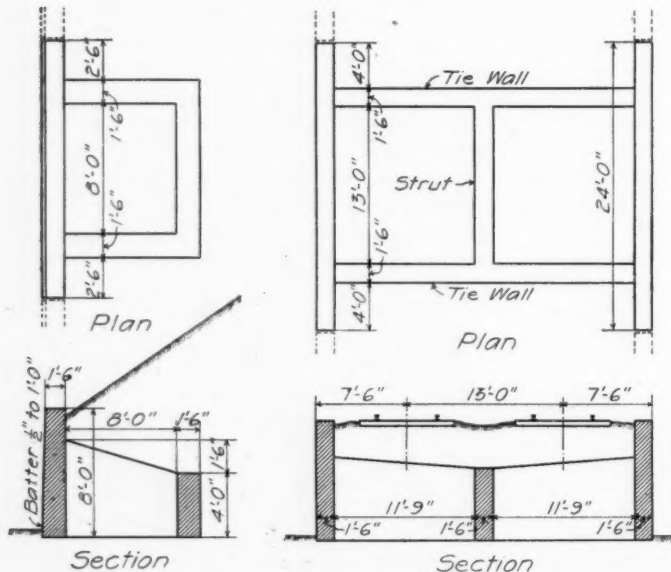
Unsymmetrical and Symmetrical Cellular Retaining Walls
